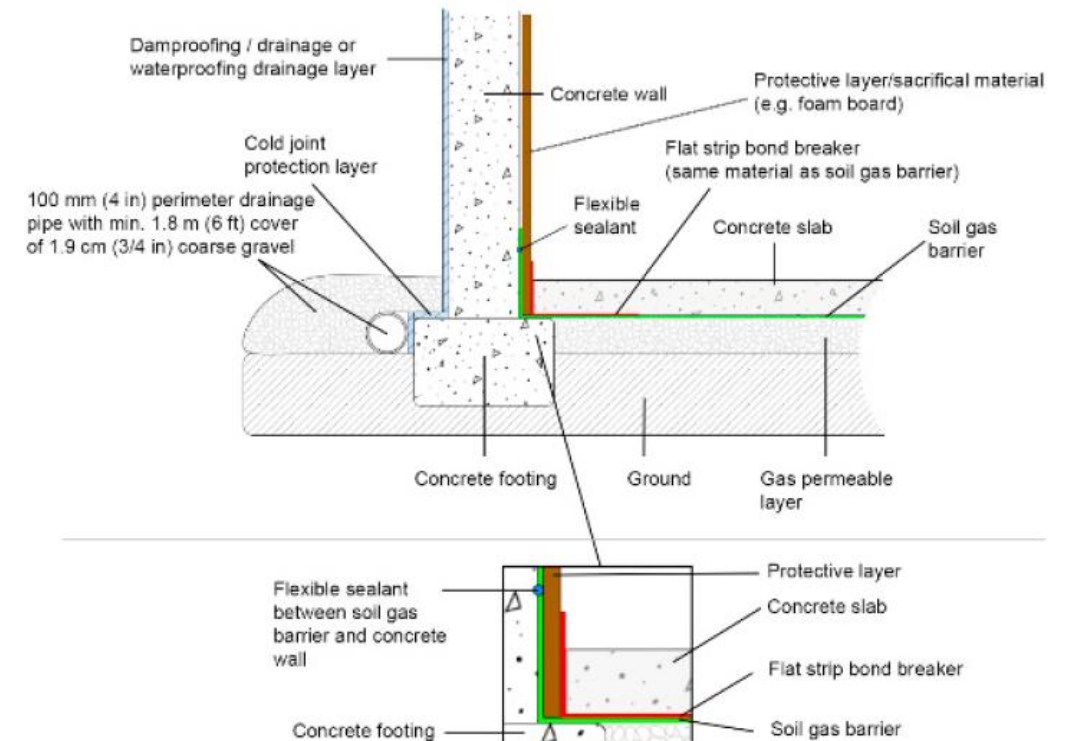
Installation of soil gas barrier on concrete foundation (without insulation - alternative)
